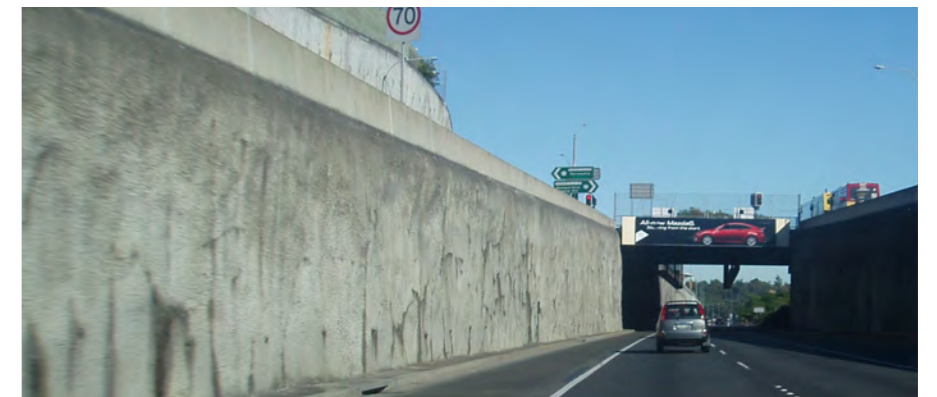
Shotcrete retaining wall at Pennant Hills Road Interchange.
